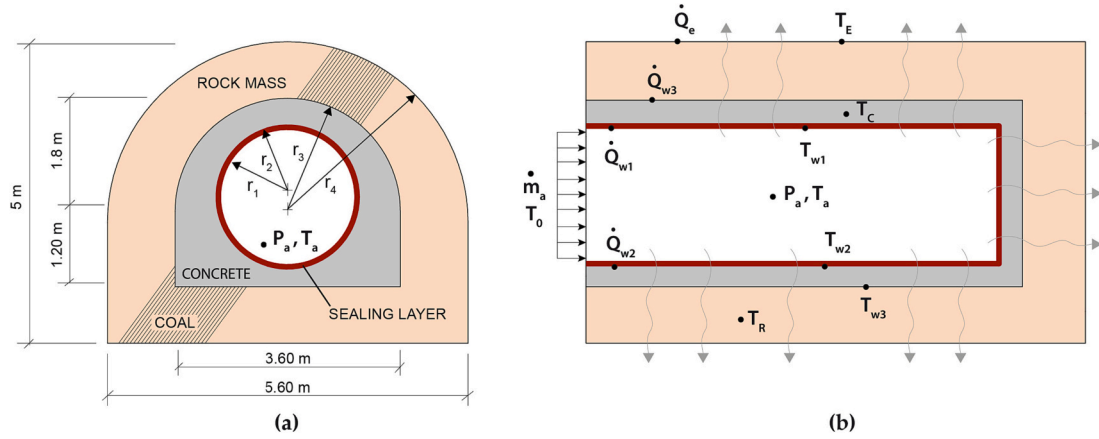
Scheme of the horseshoe-shaped concrete lining tunnel used as compressed air reservoir (a) cross-section; (b) longitudinal section.
